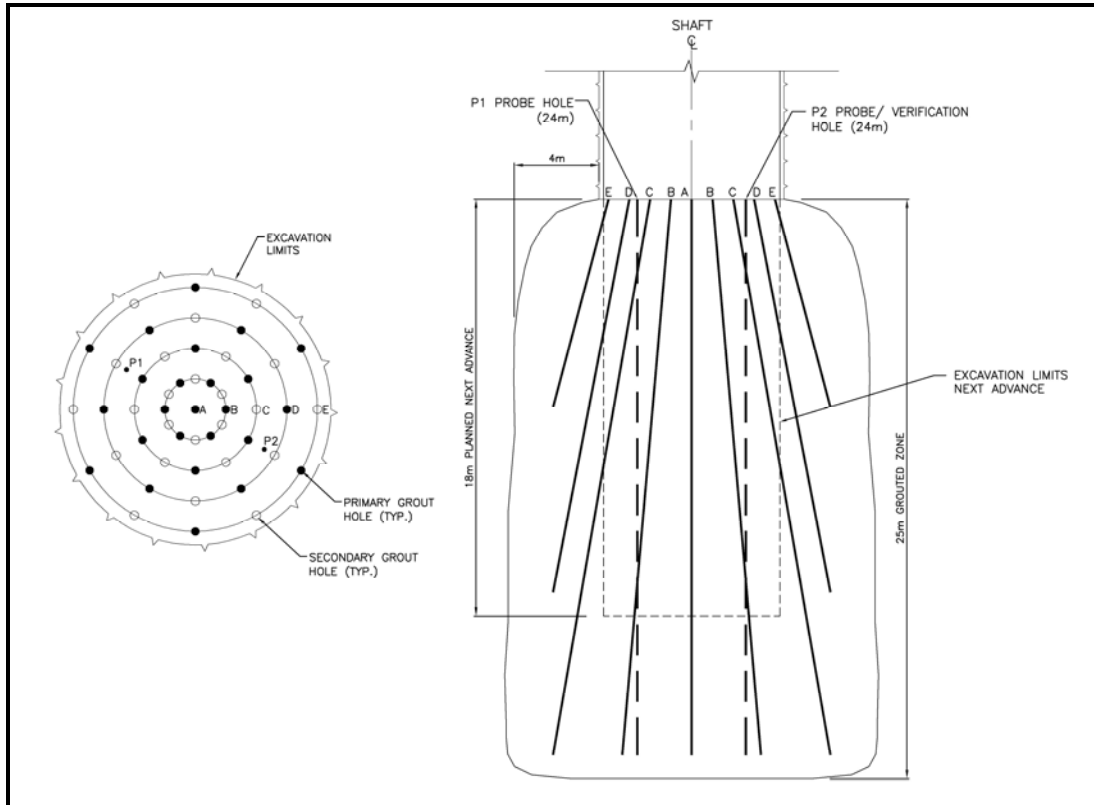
Possible Reach 2 Supplemental Grouting Arrangement
